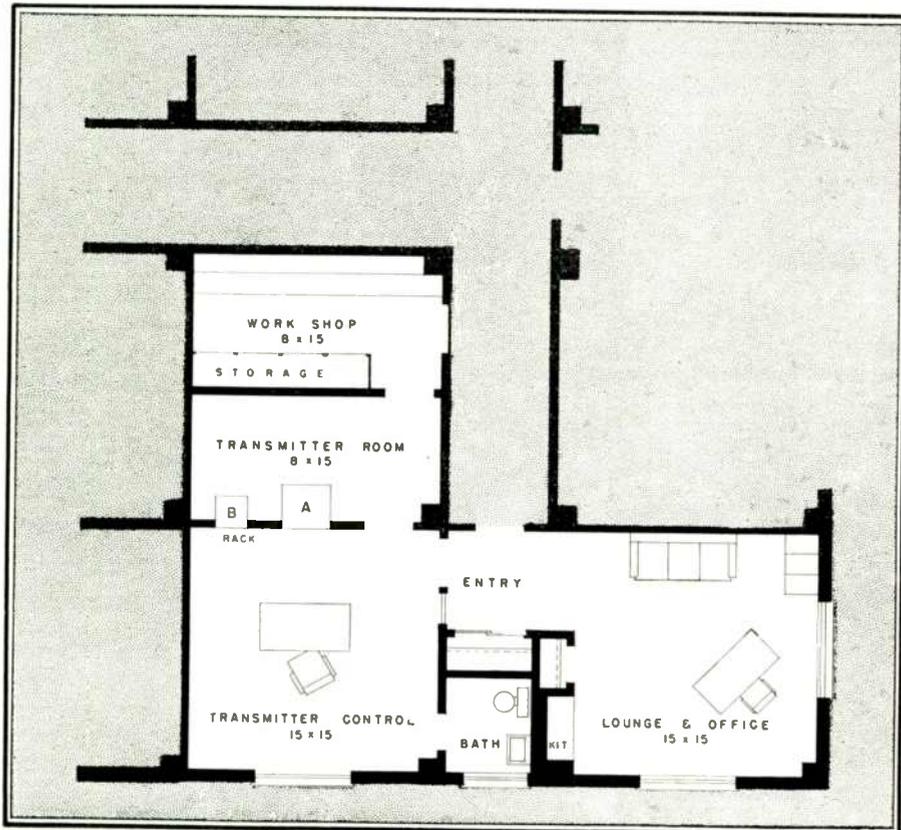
AN ALTERNATE PLAN, ALSO ADAPTABLE TO A SEPARATE TRANSMITTER BUILDING
